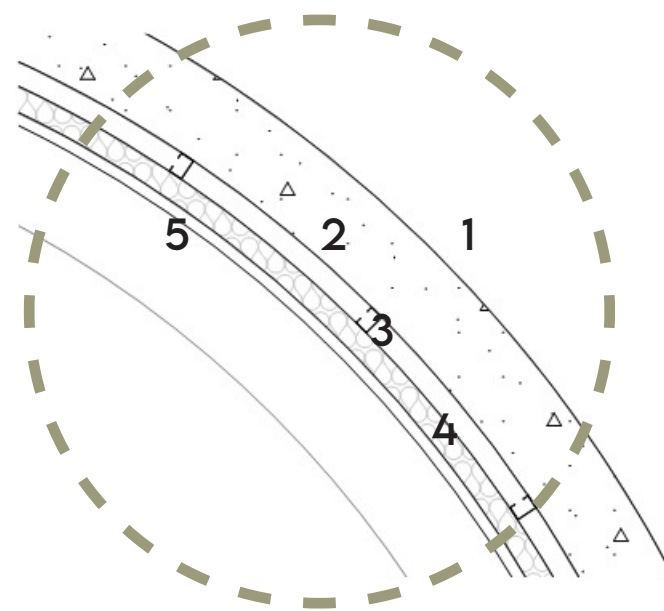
Subterranean seed bank floor plan enlarged (Du Preez, 2021).
